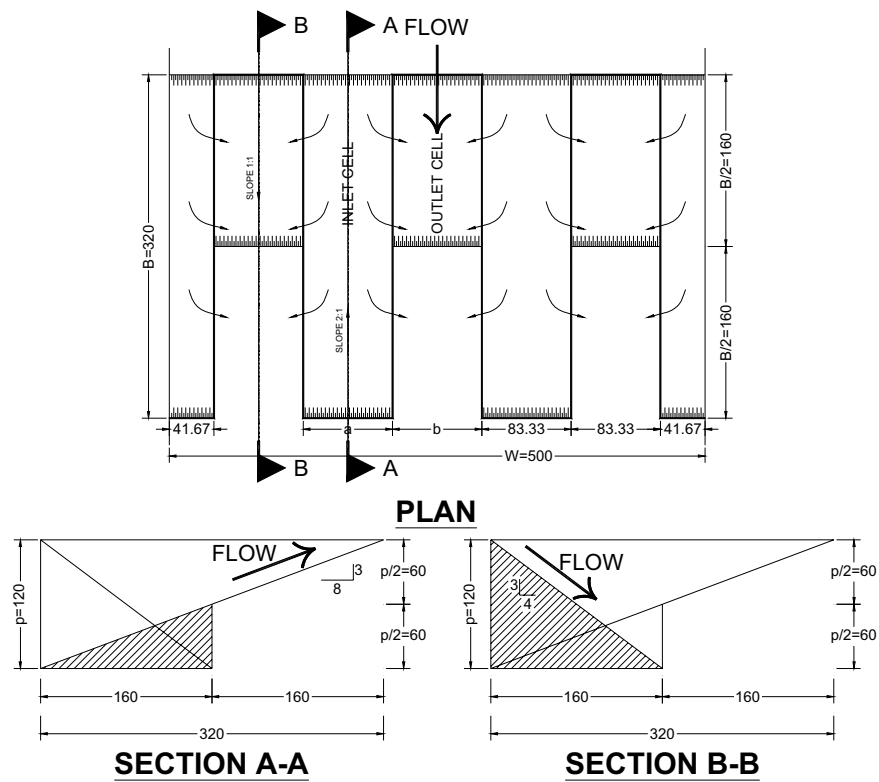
Plan and section of model P_4M_4 (both sides ramping), (dimensions in mm)
